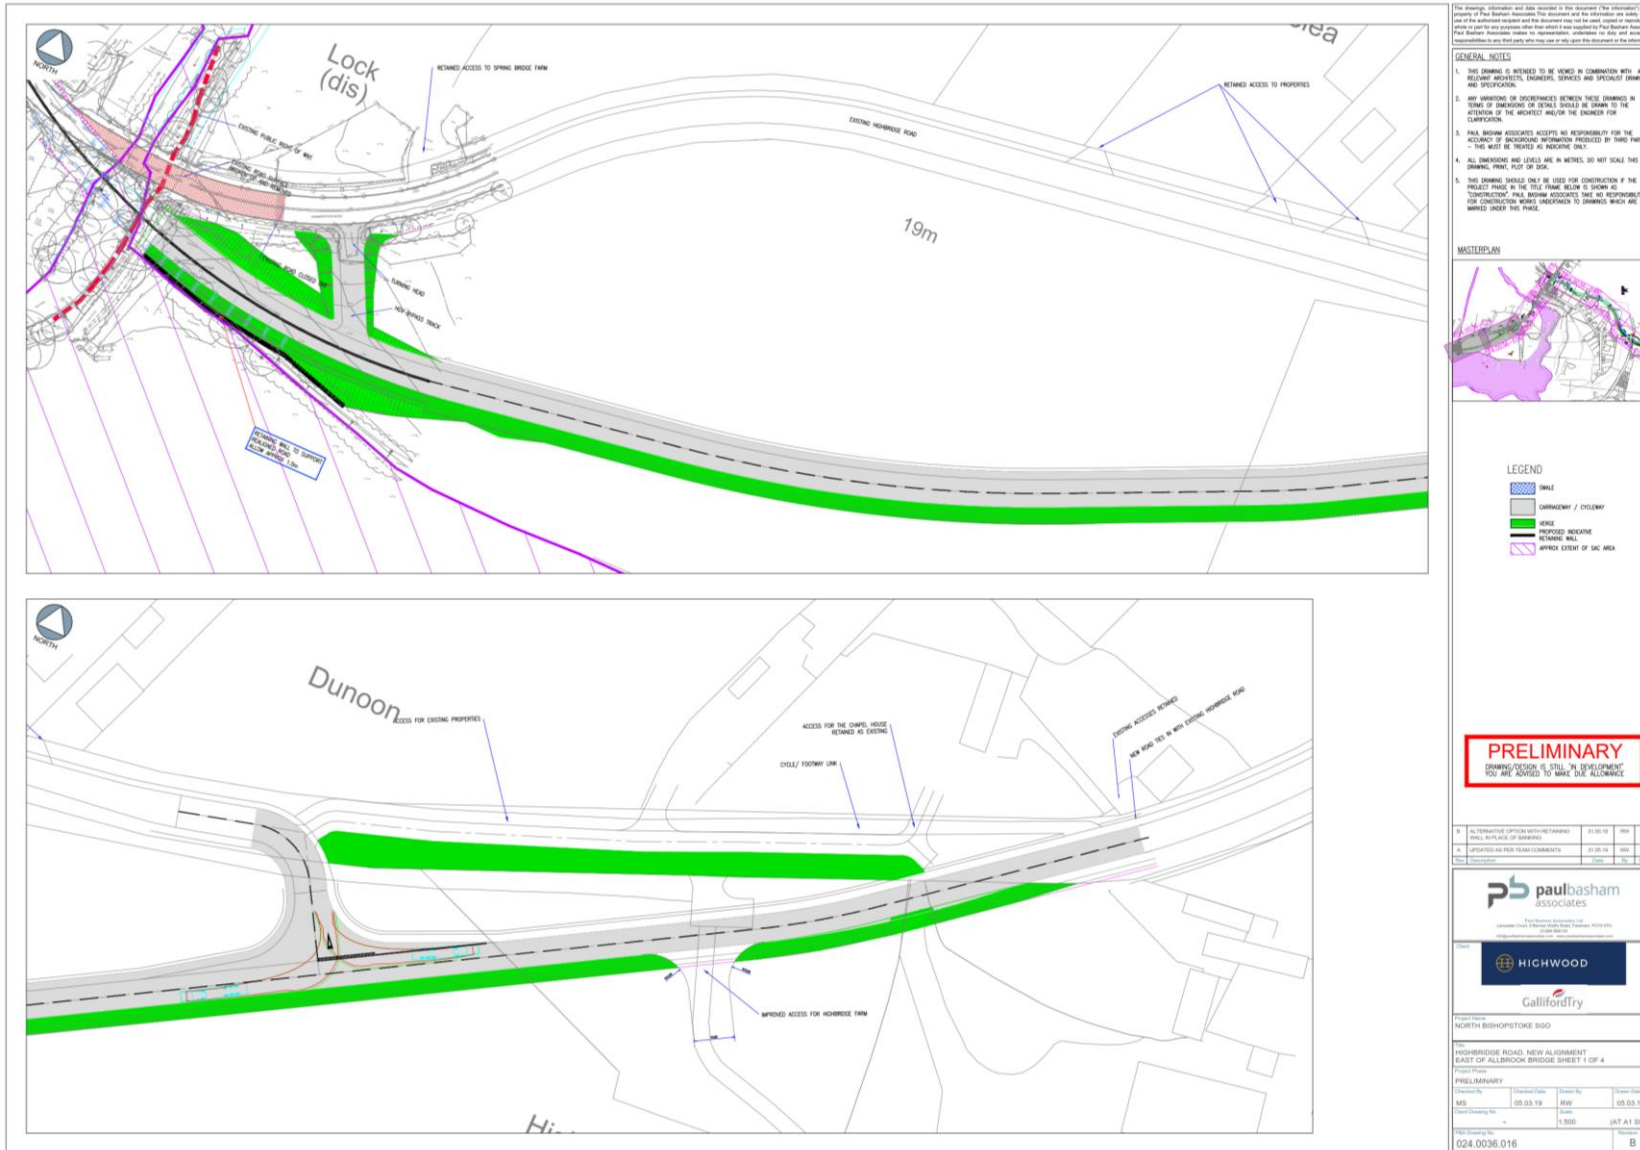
Realignment of Highbridge Road showing retaining wall outside of the River Itchen SAC
